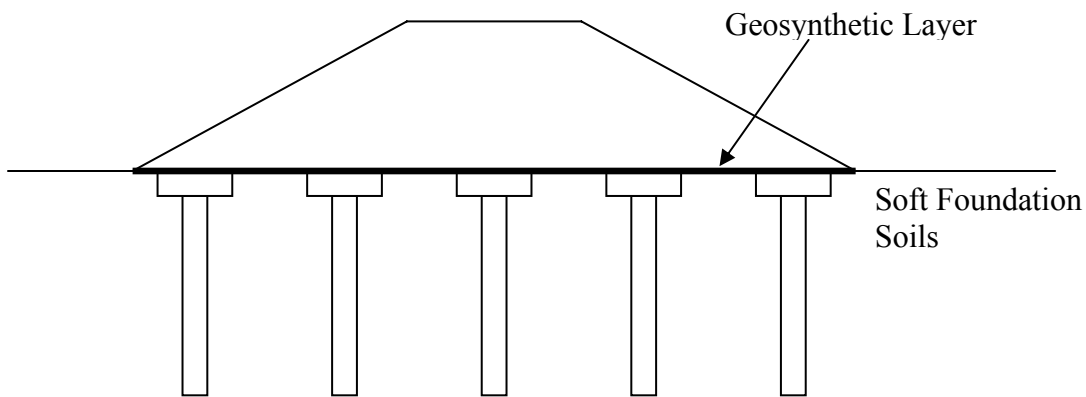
Pile-supported embankment with geosynthetic reinforcement (after Jones et al. 1990)
